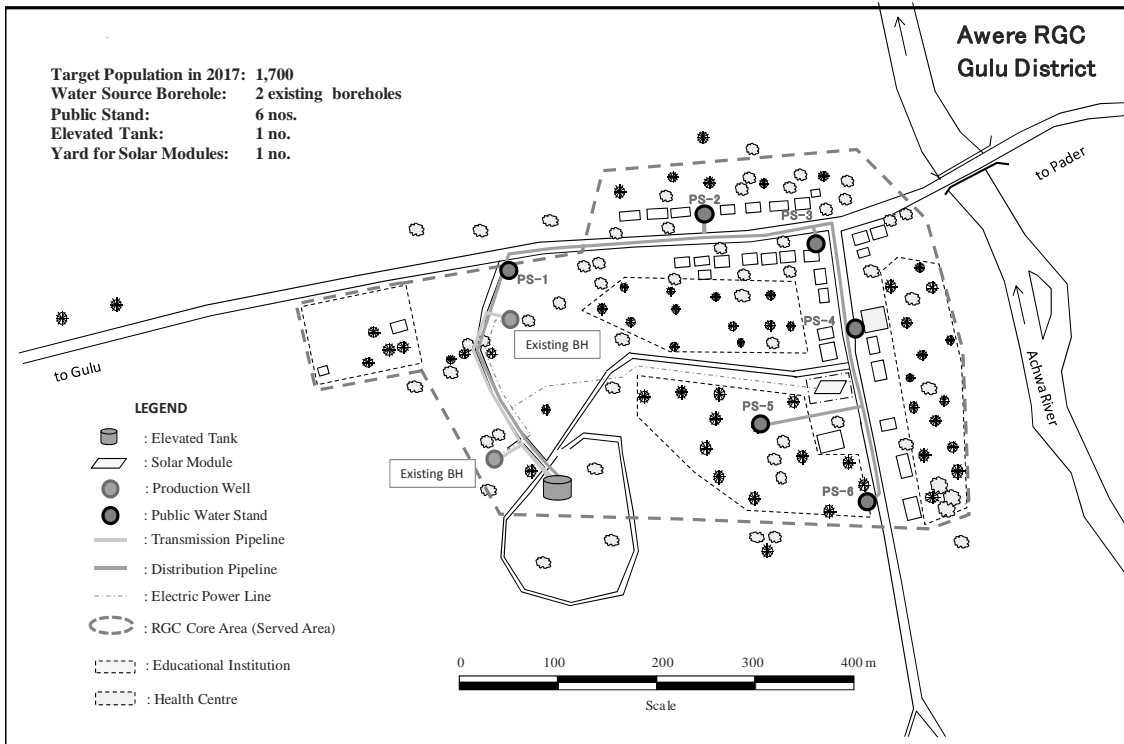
General Plan of Piped Water Supply Facility (Awere RGC)
